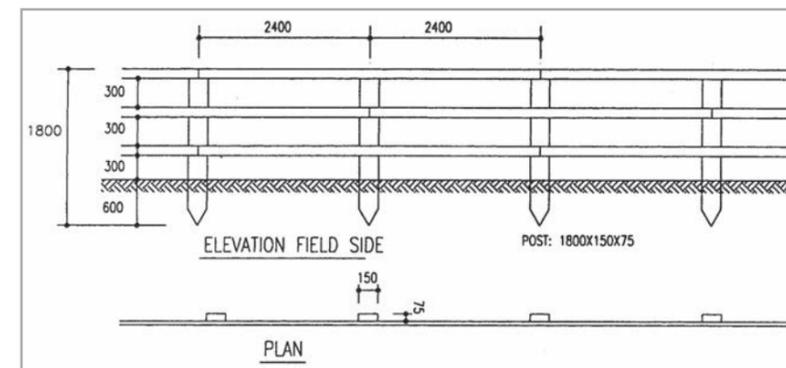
Post and rail stud fencing (measurements in mm)
